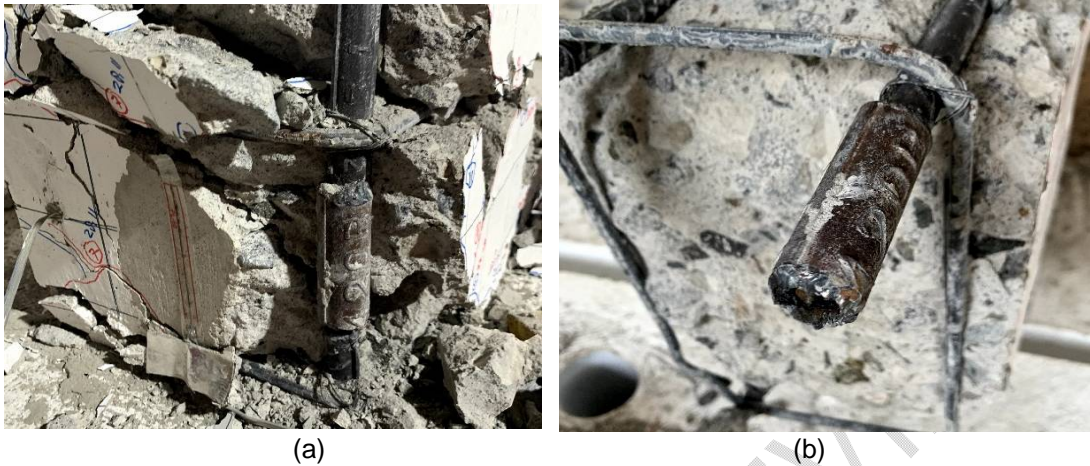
(a) Failure location of steel rebar (b) Detail failure condition of steel rebar.
